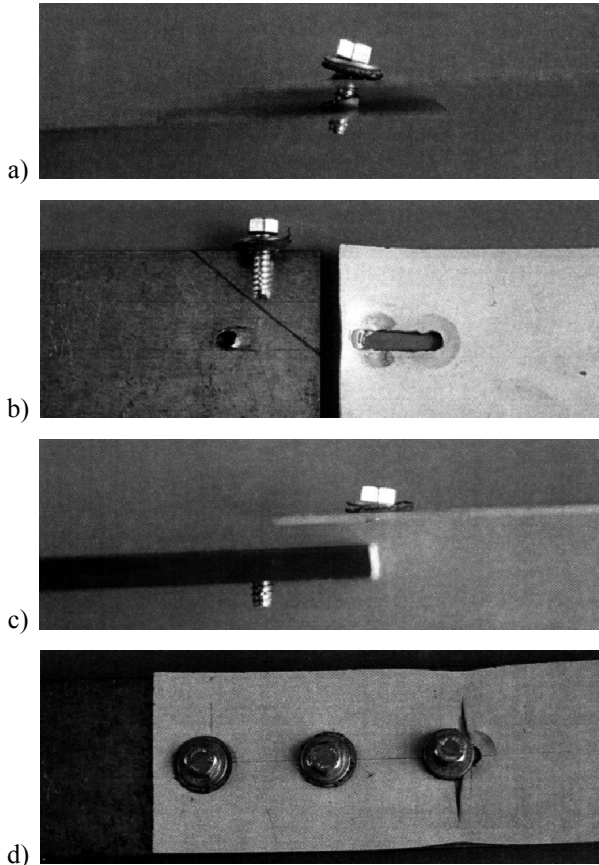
Test evidence for failure of screwed connections: a) Tilling and pull-out of screw; b) Tearing of upper sheet; c) Shearing of screw; d) Net section failure
